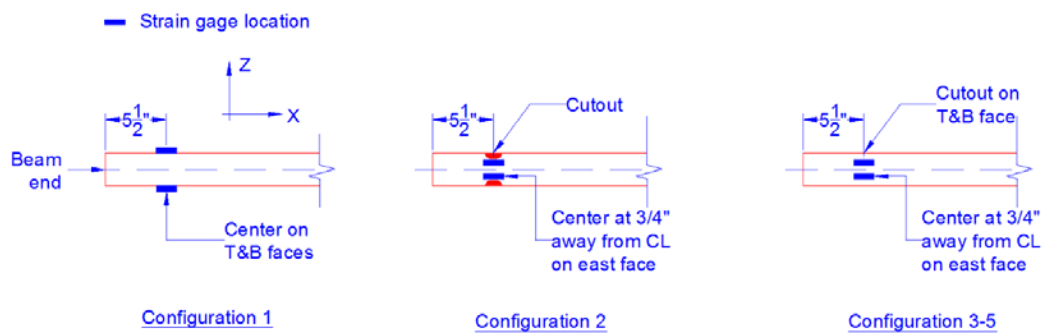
Detailed strain gage location: Configuration 1, Configuration 2, and Configuration 3-5 (left to right)
